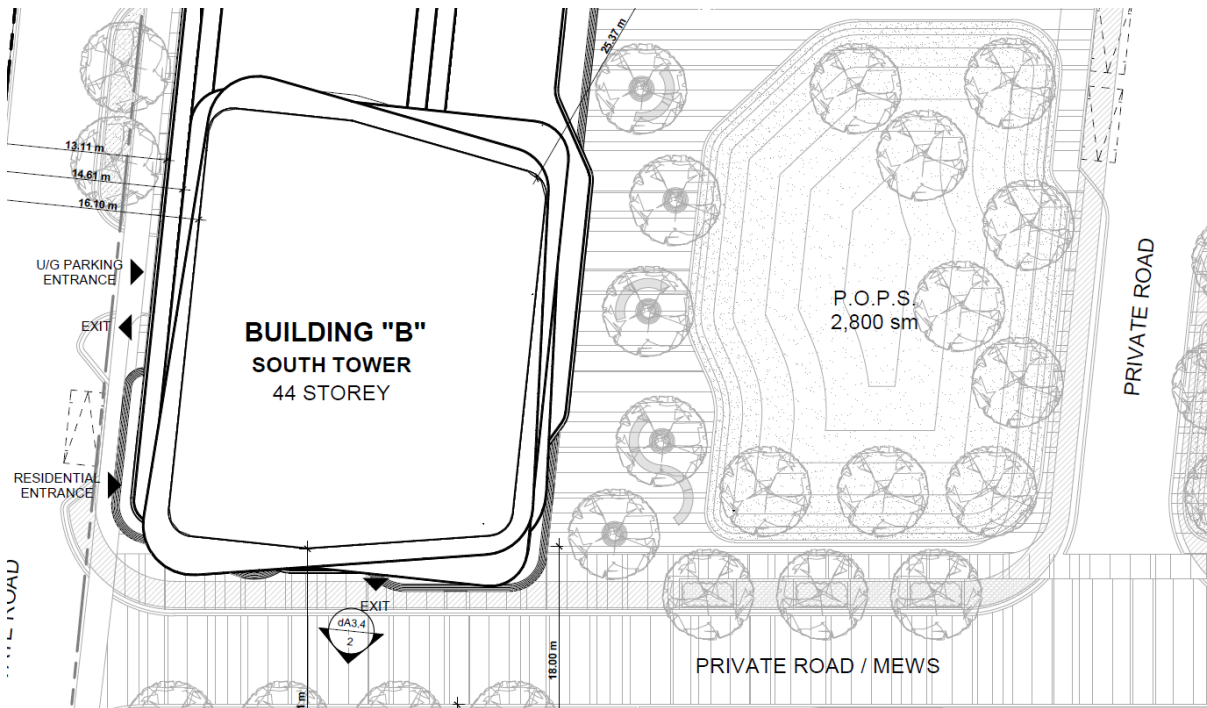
Site Setbacks - Building B South Tower (Source: Architectural Drawings, p. 7)
